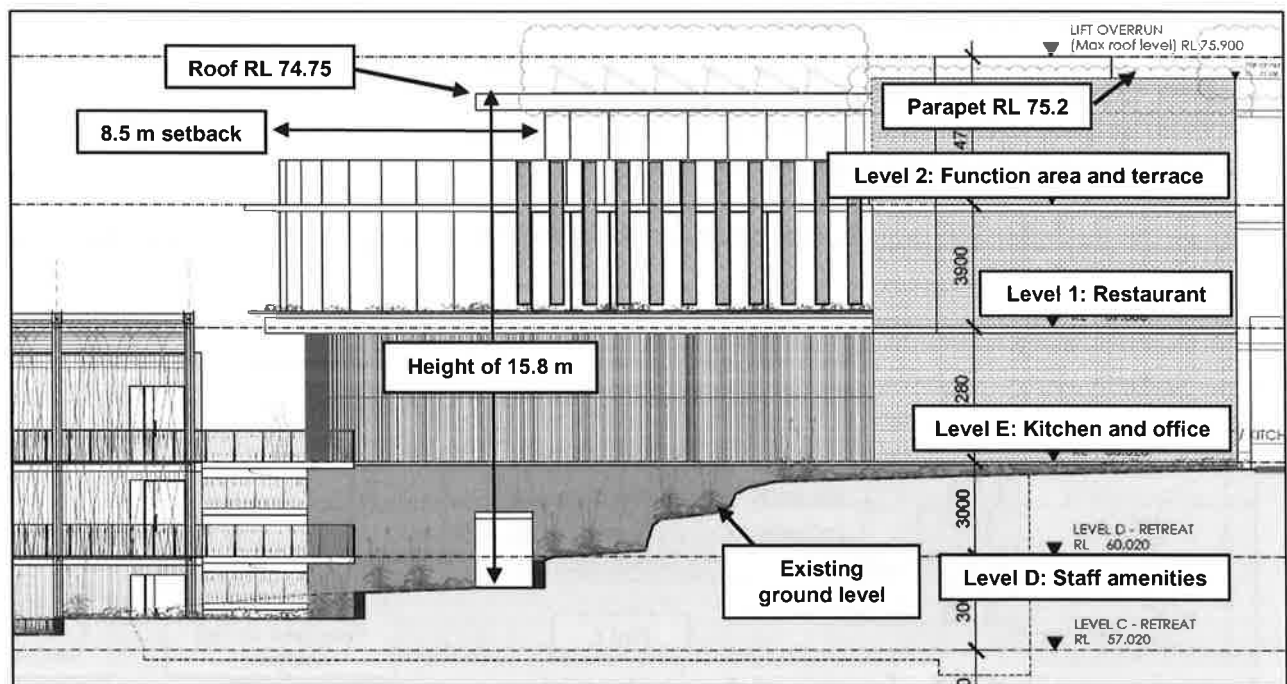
East elevation of Taronga Centre addition (Base source: Architectural plans)
